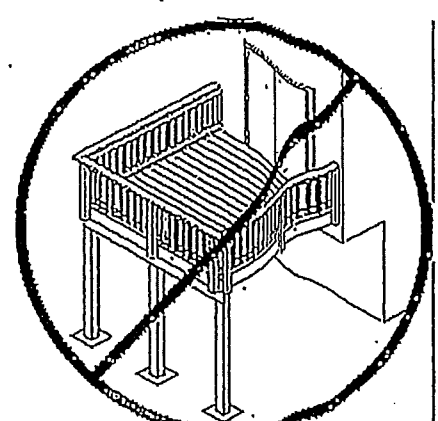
NO ATTACHMENT TO HOUSE OVERHANG
